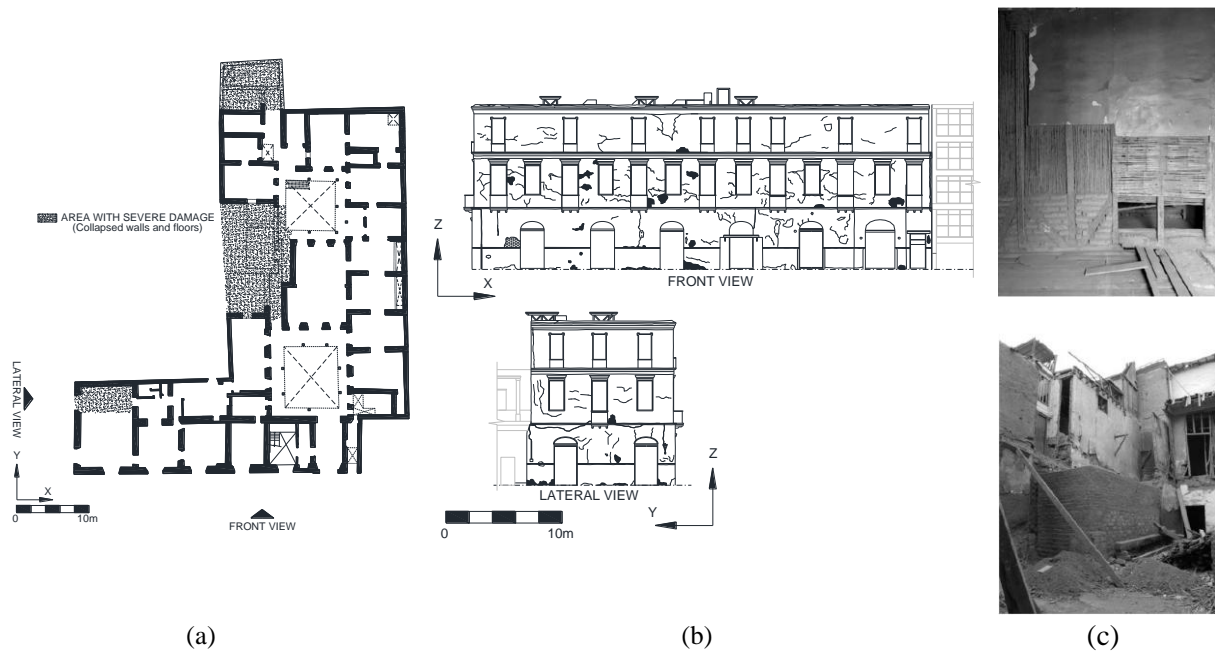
Damage condition of the building: (a) plant view of the first floor [adapted from 2]; (b) elevation view of the front façades [adapted from 2]; and (c) interior of the building
